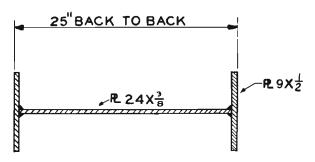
Cross section through welded plate girder equivalent to 21-inch 63-pound rolled beam.
